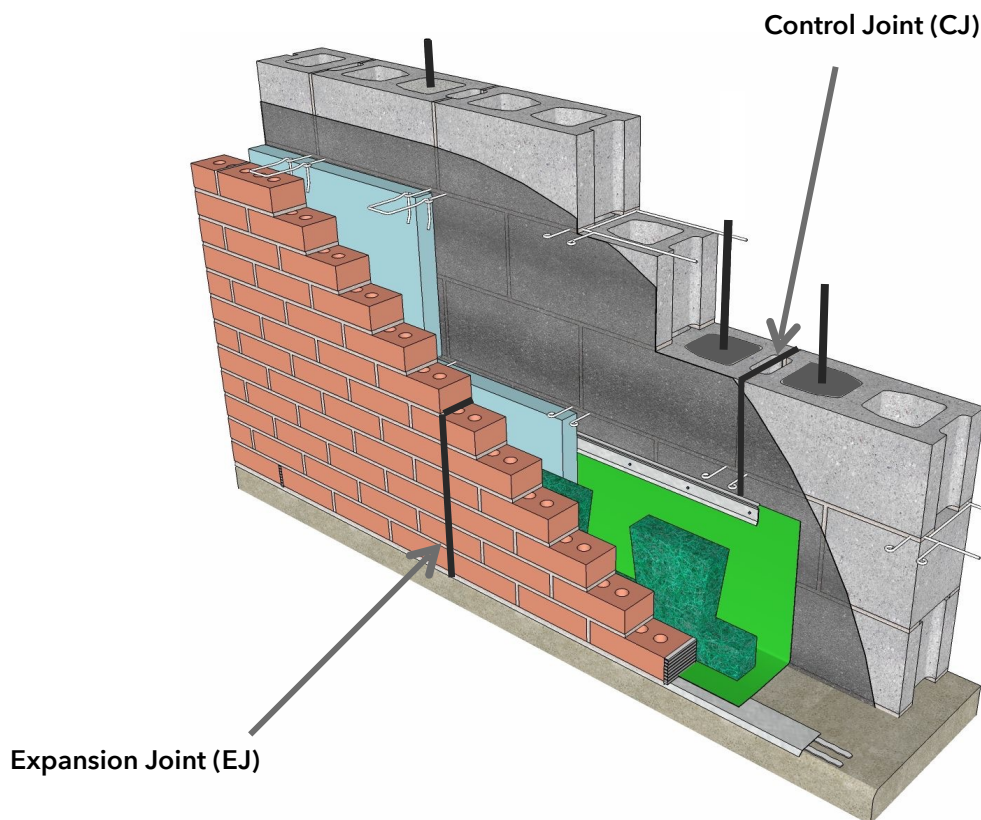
EJs in the Clay Brick Veneer and CJs in the Structural Concrete Masonry
